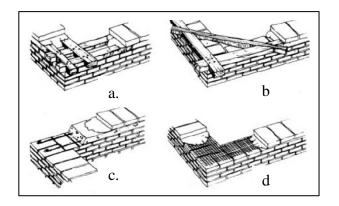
Examples of cages, a. half interlocking, b. half interlocking wooden cages at the corner connection, c. reinforced concrete cages, d. wire cages [39]
